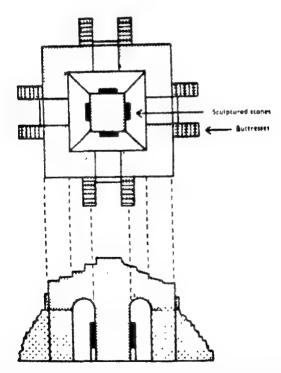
Fig. XIX. Hmwaza (Prome, Burma): plan and section of the Lemeythna
